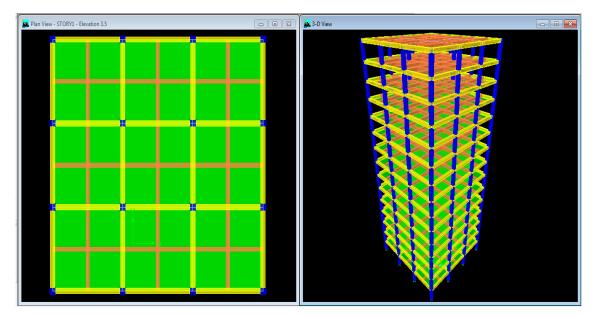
(b): Plan view and 3-D view of 15 storied building
